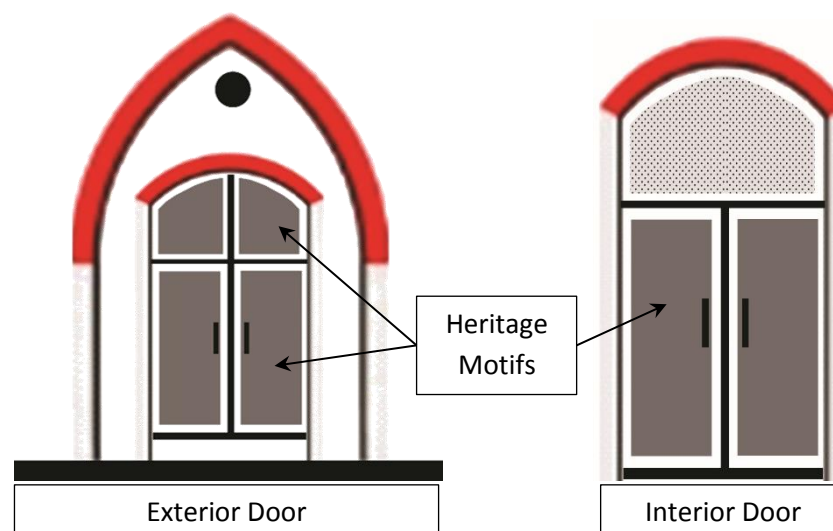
Example of an outline of interior and exterior doors. Source: Author.
